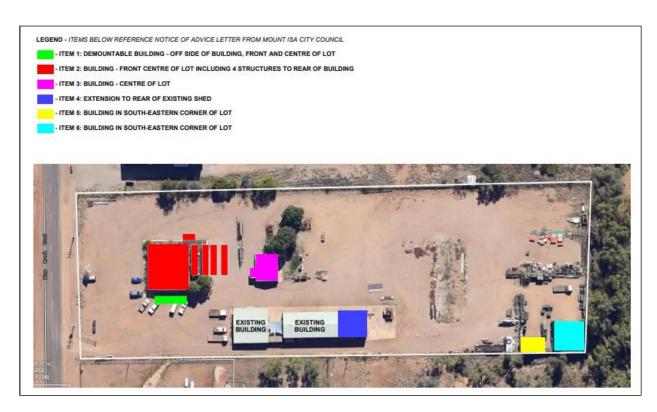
PLAN OF DEVELOPMENT (EXISTING)
